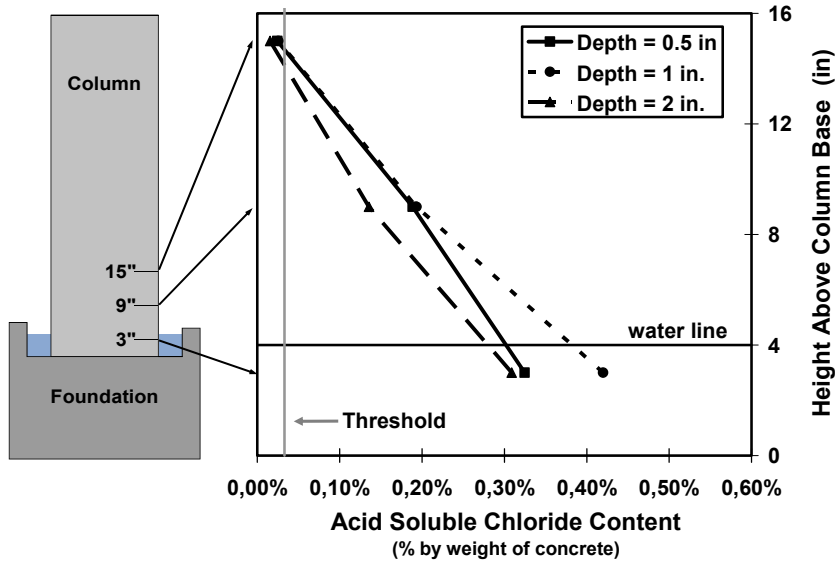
Concrete Chloride Penetration for Column NJ-TC-S in Dripper Side at End of Testing
